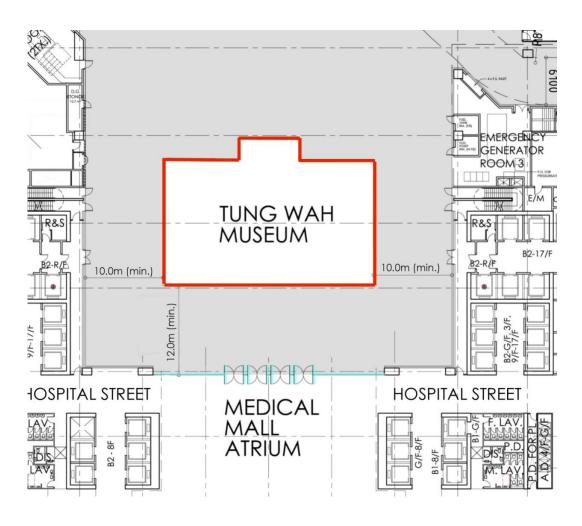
Proposed Ground Floor Plan showing the Extended Forecourt
